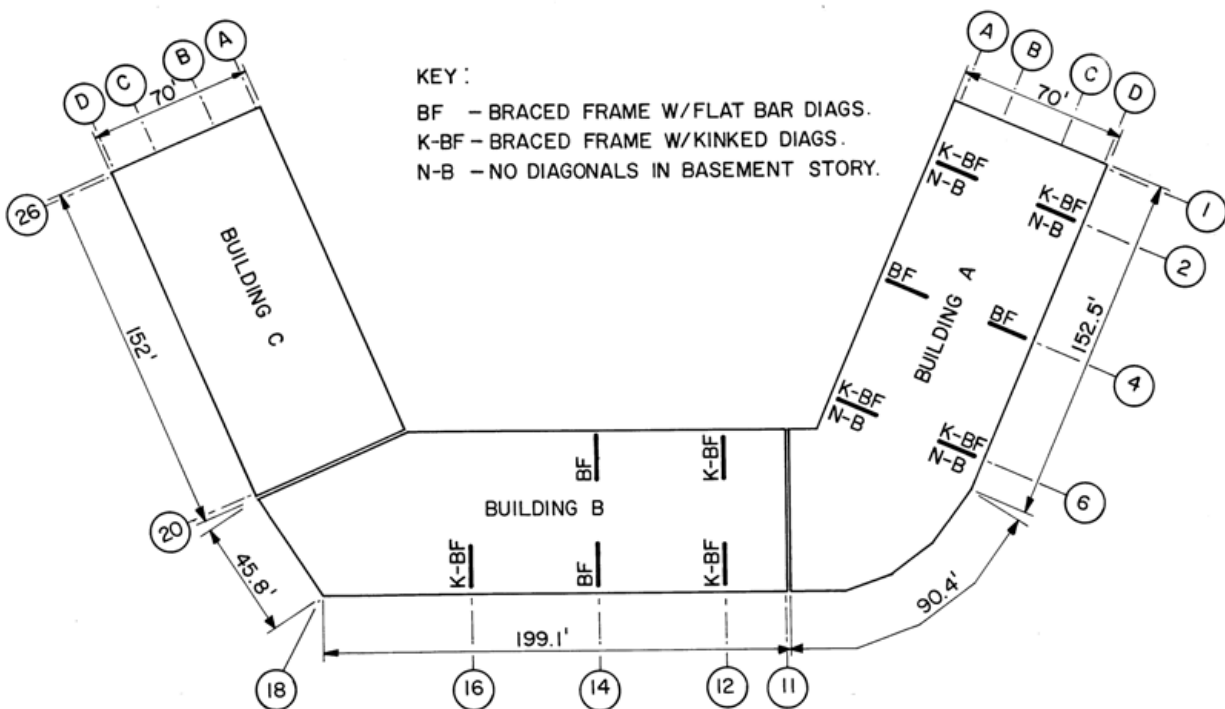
Schematic plan of typical floor of condominium complex, showing locations of braced frames.
